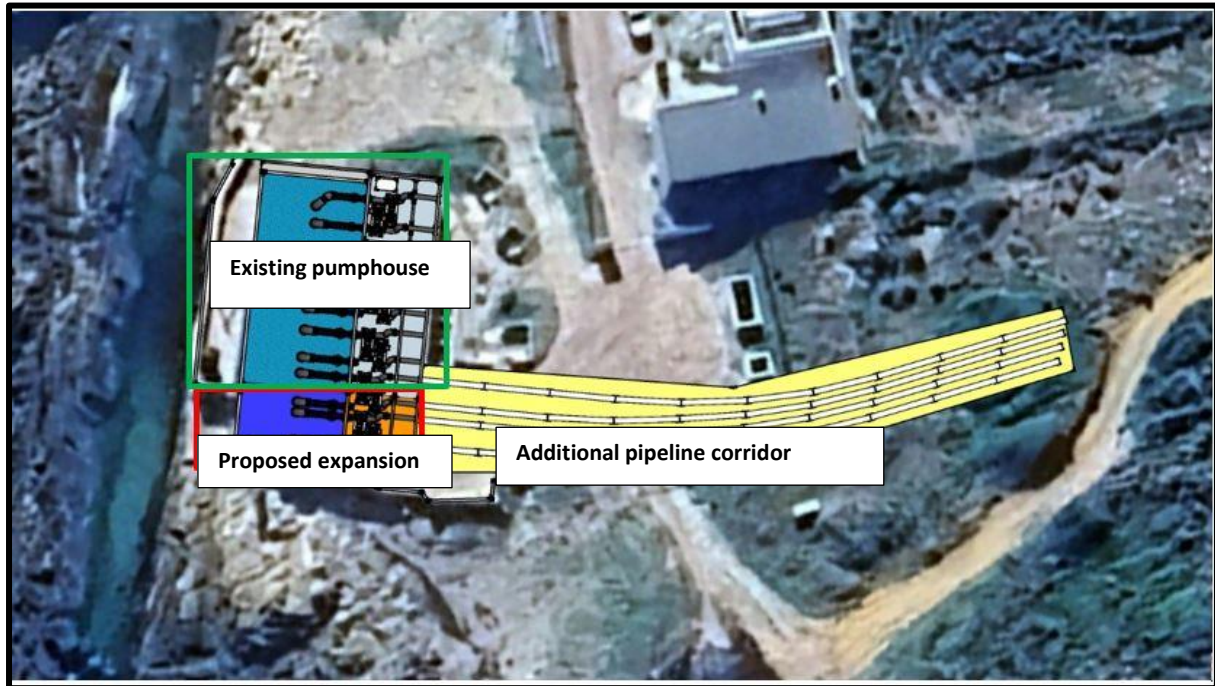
The existing pumphouse (green) will be extended (red) for the installation of new additional pipelines.
